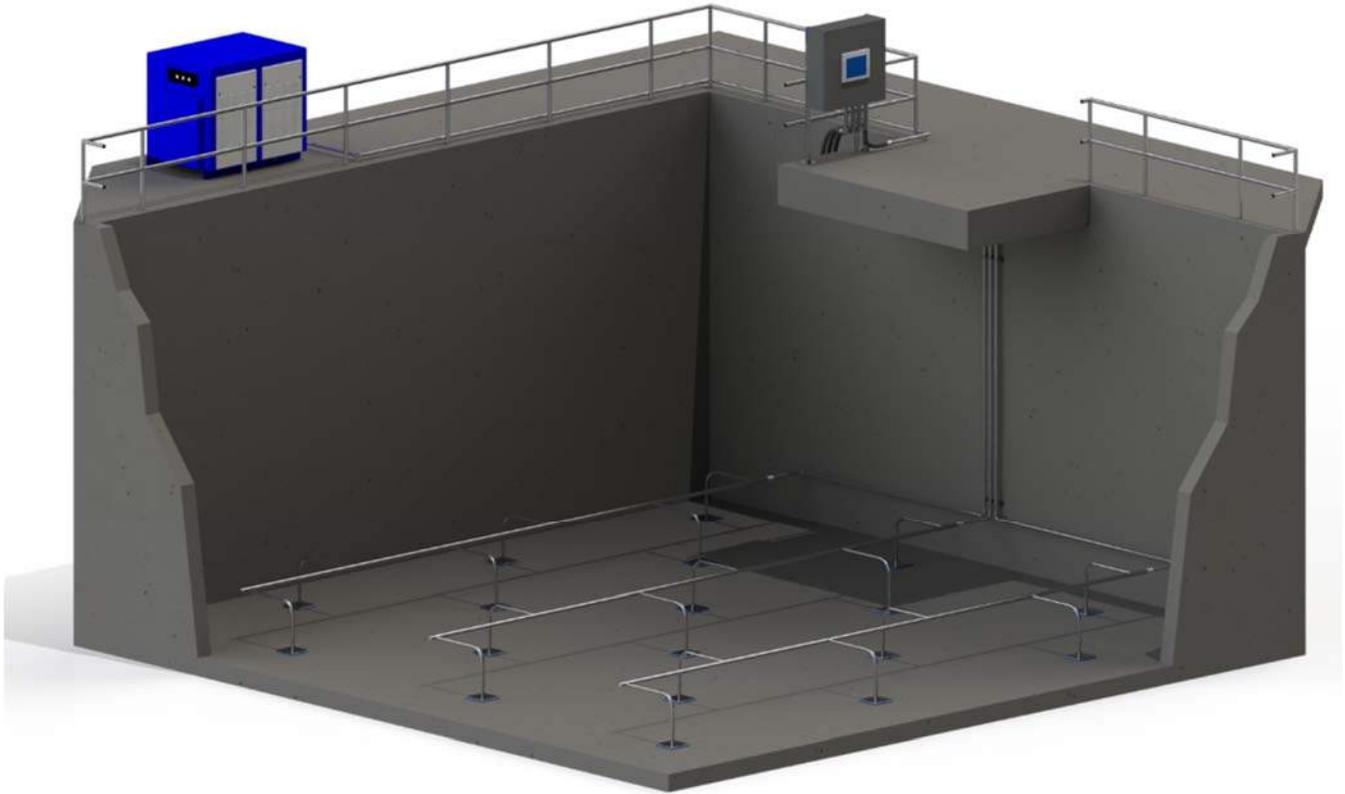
Typical Compressed Gas Aeration/Mixing System
